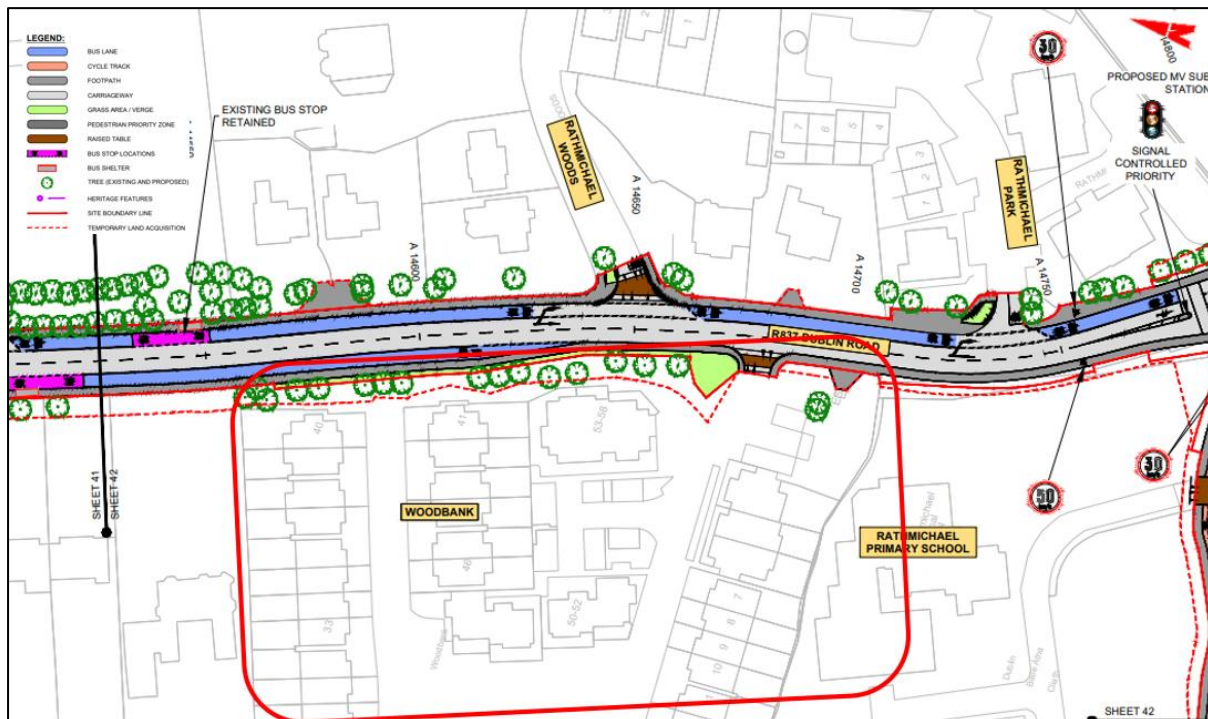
Extract from General Arrangement Drawings at Dublin Road (Sheet 42)
